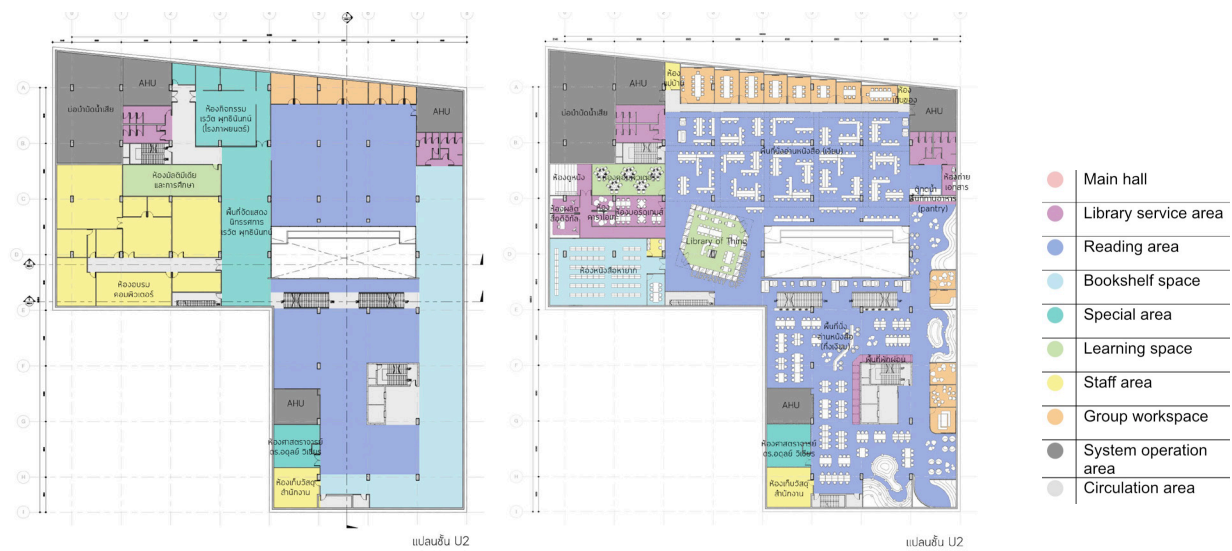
Comparison of U2 floor plans (left) Current plan and (right) New plan.
